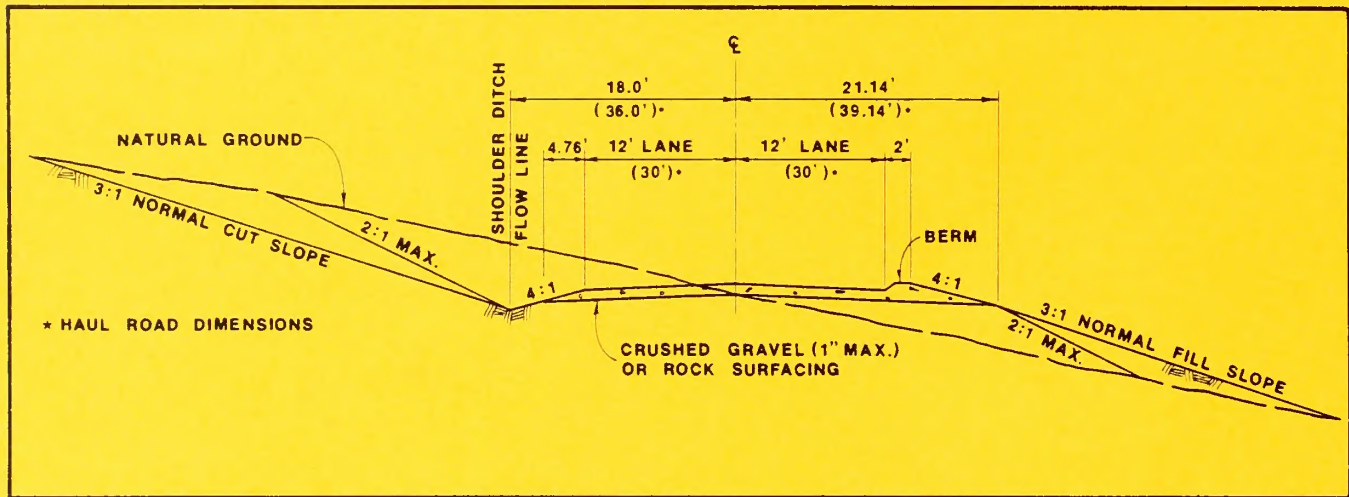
Typical Section of Road Where Natural Ground Slopes are 4:1 or Flatter
